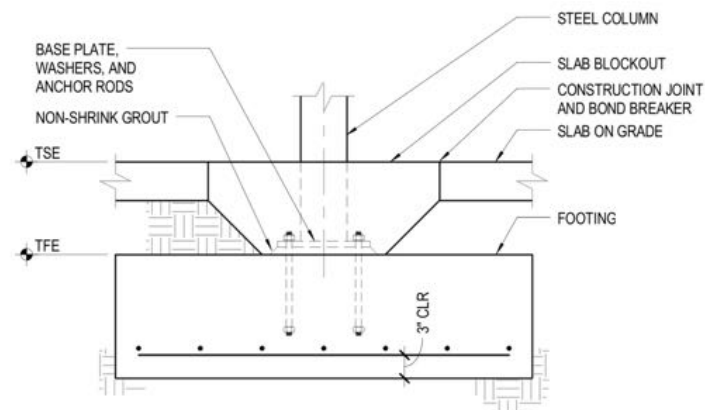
Typical Interior Column Footing Detail (provided by HGA)
